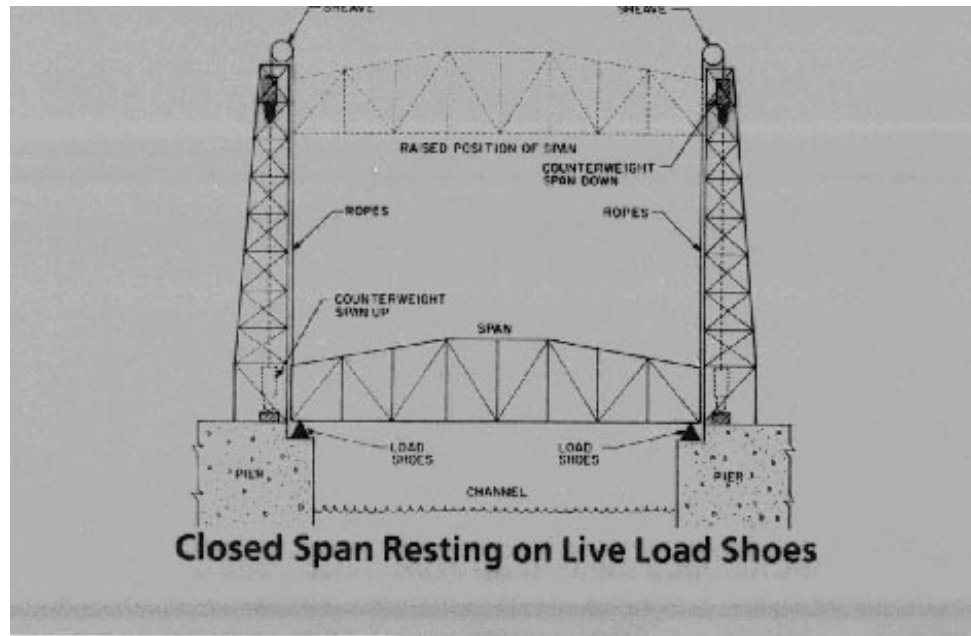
Closed Span Resting on Live Load Shoes
